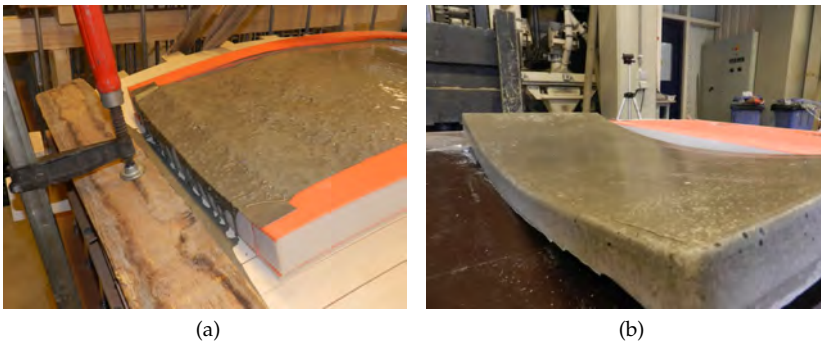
Batch 2 - element 2.1 (a) during casting - mould is overflowing, due to fluidity and slight segregation of concrete, still too high at 45 minutes after mixing (b) after demoulding - smooth surface, but unequal thickness
